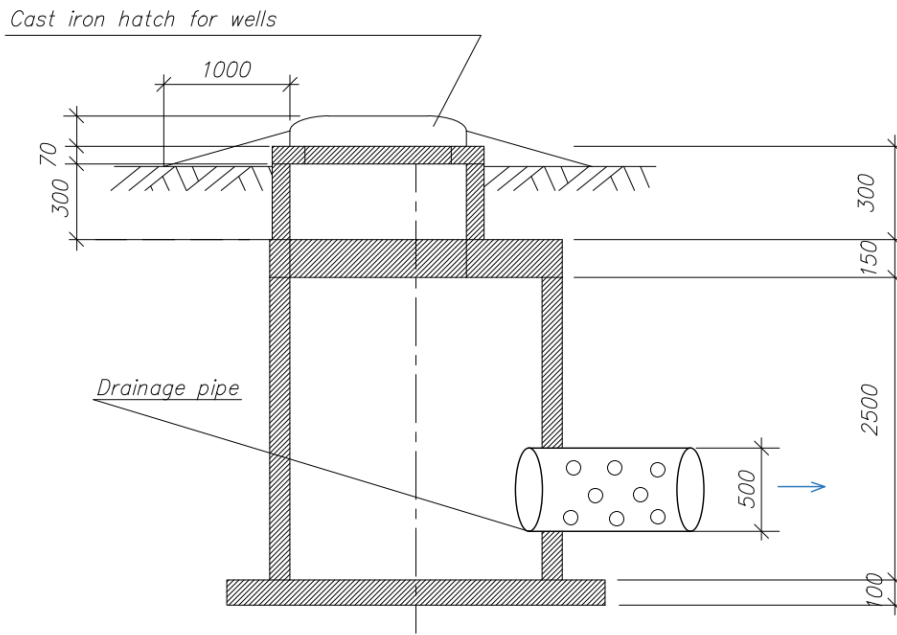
Cross-section of a closed horizontal drain and its water-collecting culvert
